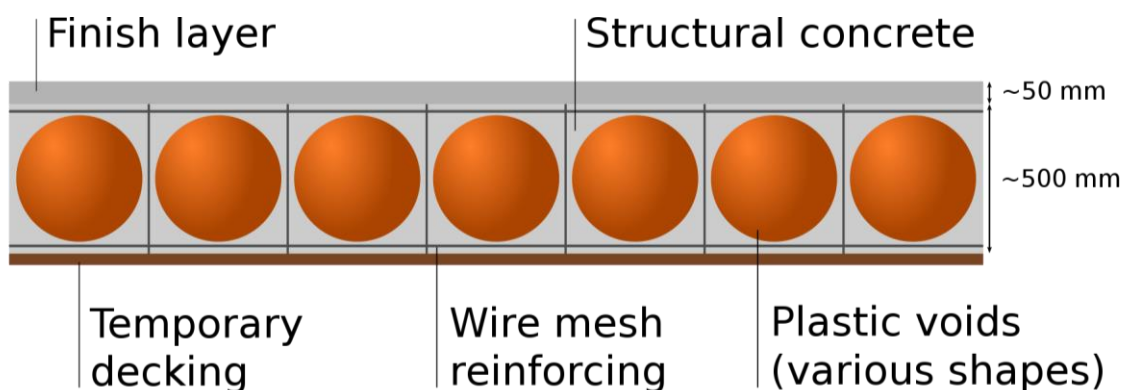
Cross-sectional diagram of a typical voided biaxial slab⁵⁴.
